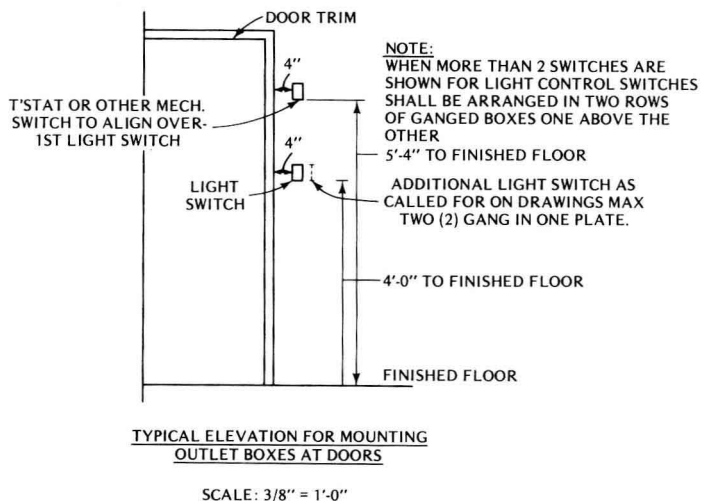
Electrical detail showing mounting height of outlet boxes.
